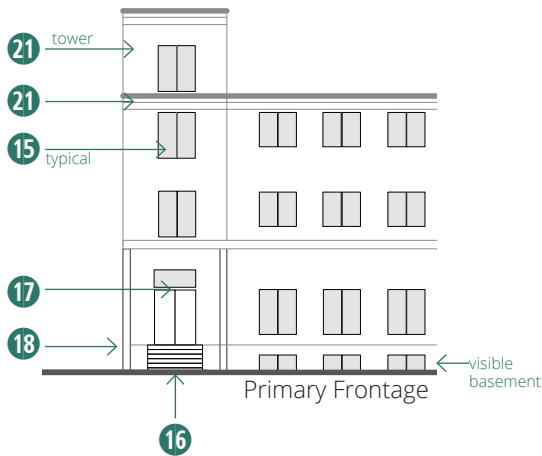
H-3. Civic Building: Facade Design Requirements
